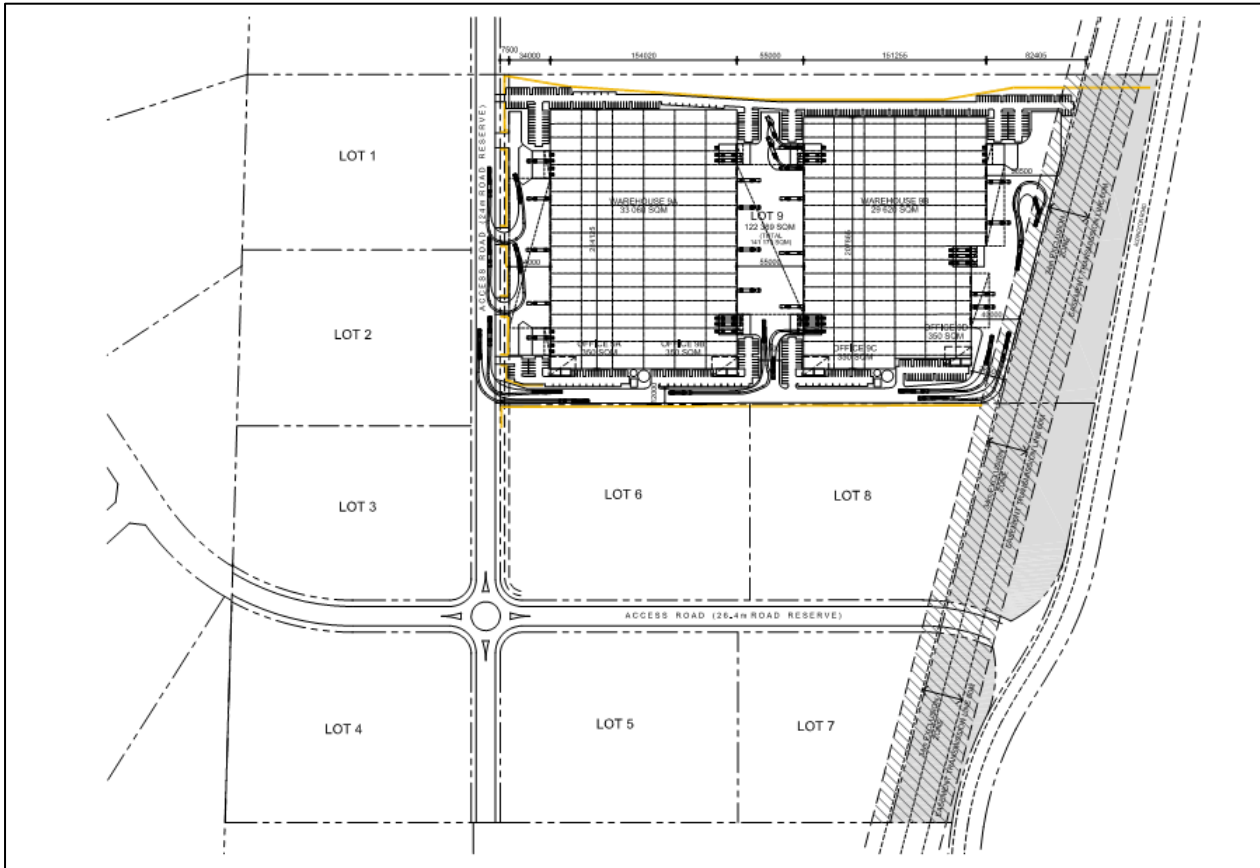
below illustrates the preliminary site layout for Proposed Lot 9.
